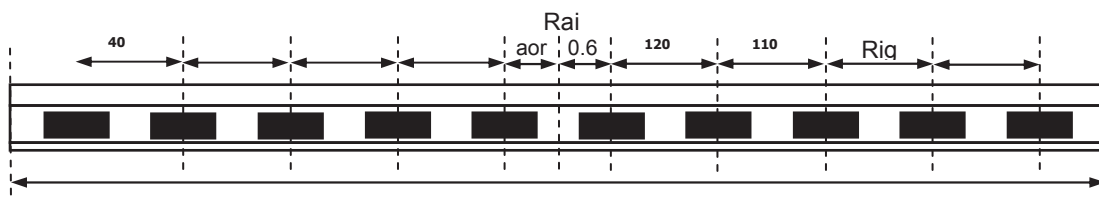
Example of damper installation with 0.6 m centre-to-centre spacing. Damper positions marked from centre-line (CL) of the rail. Dimensions in metres.
